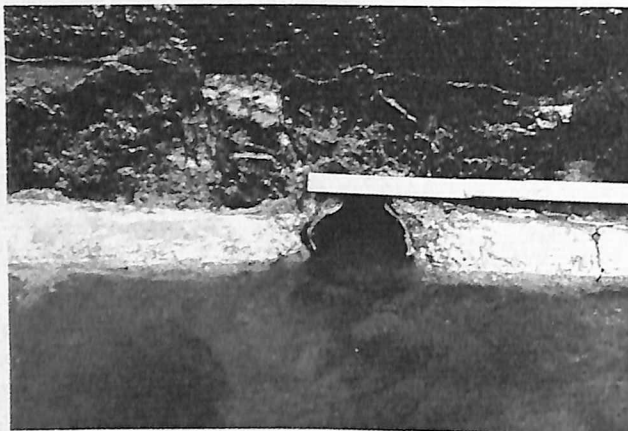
This water pipe with a diameter of seven centimeters is found on the flooring of the second circle on its dividing wall in the west quadrant.
